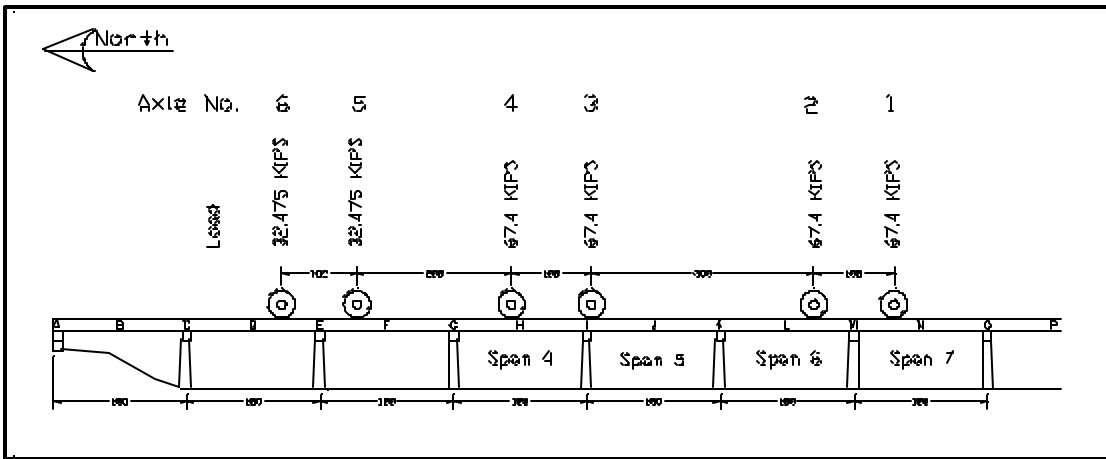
Loads applied to Bridge 32.35 due to load position 1-2@M. Dimensions are in inches.
